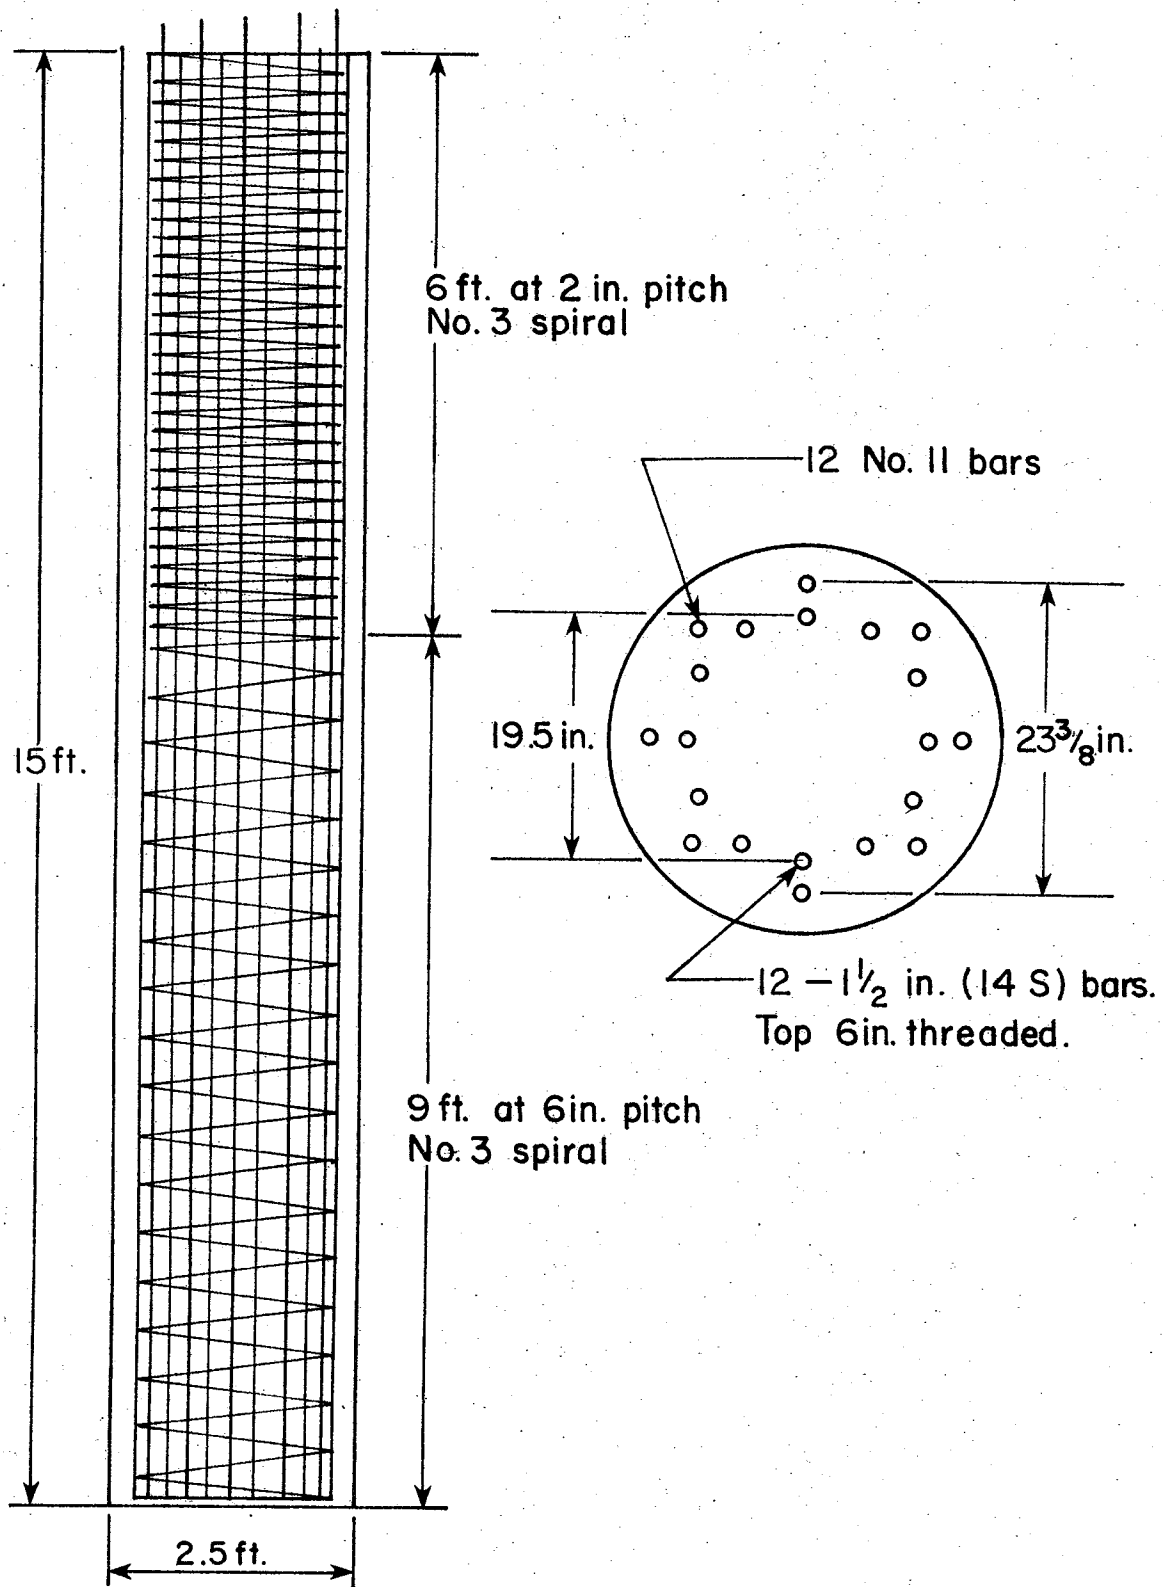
Drilled Shaft Reinforcing (1 ft. = 0.3048 m, 1 in. = 2.54 cm)
